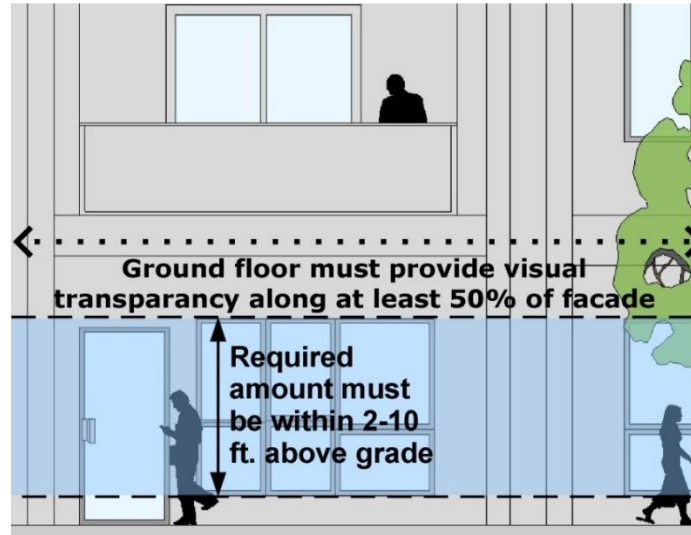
Ground Floor Transparency; 17.7.2.4:A
